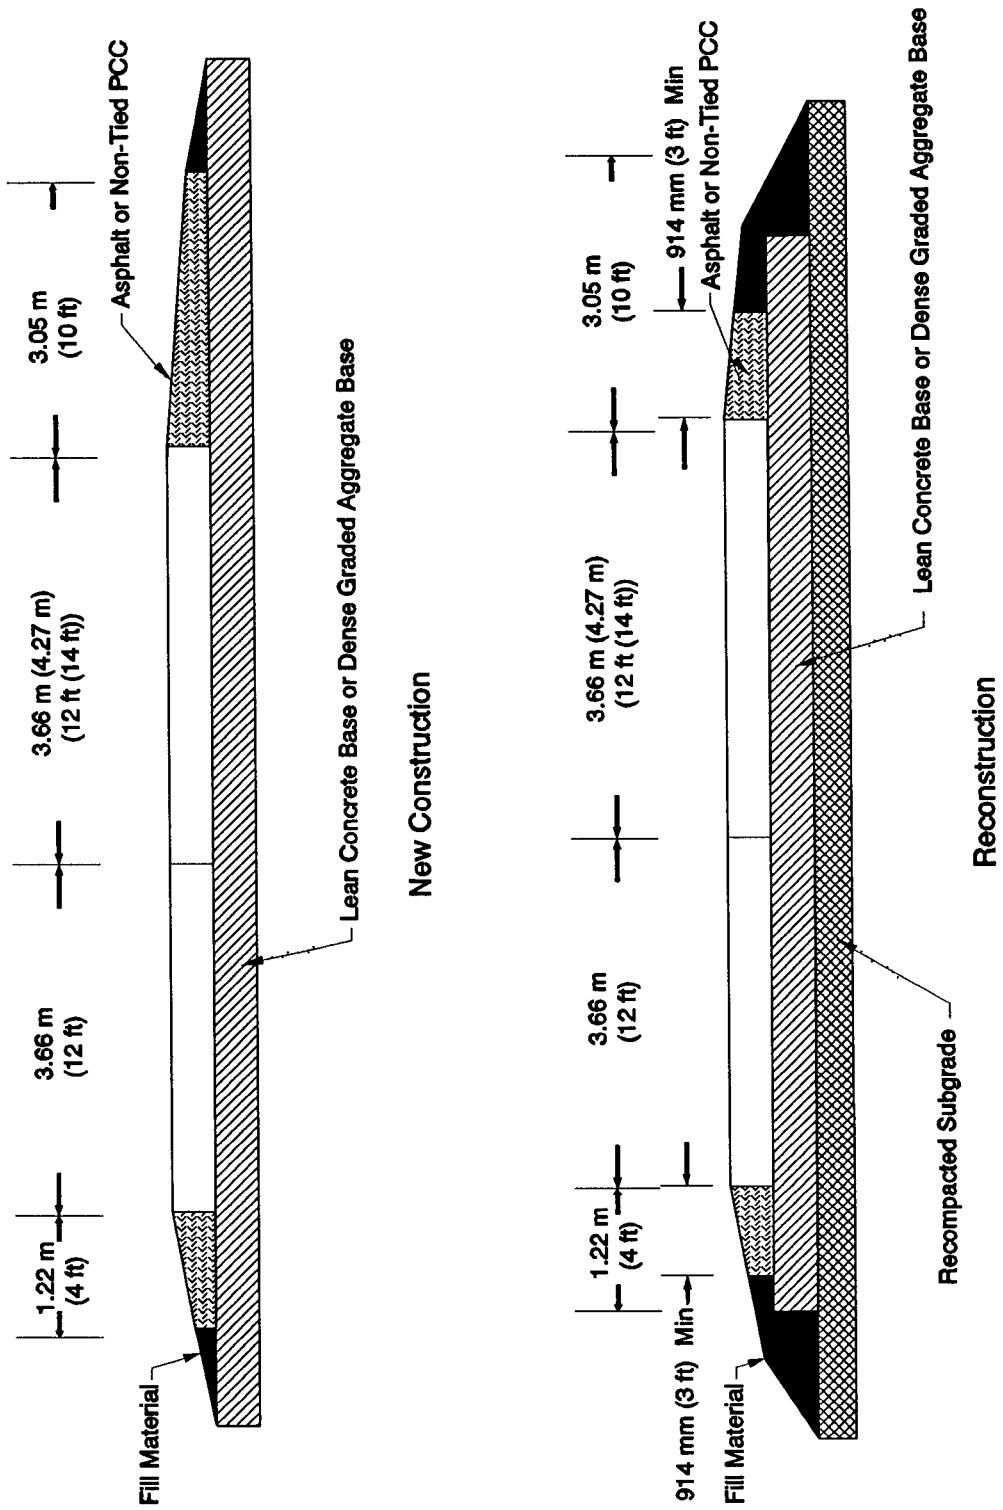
Typical Section for Test Sections with Non-Drainable Base
